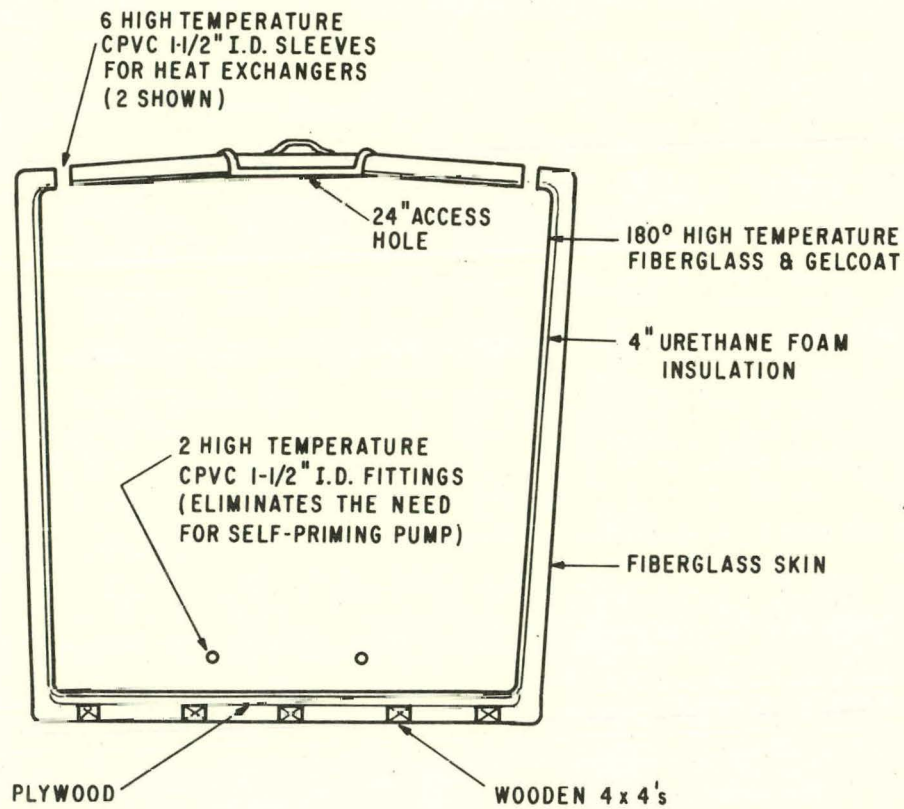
Sample Drawing of a Factory-insulated FRP Tank
